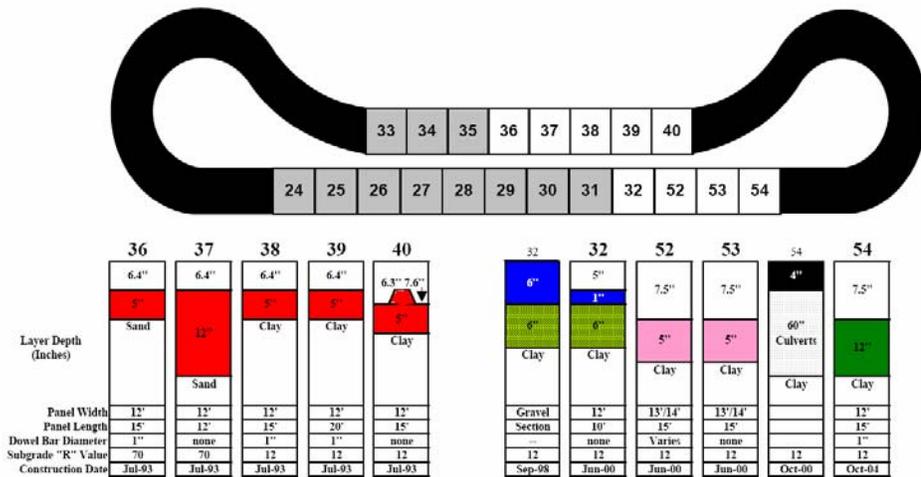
Mn ROADS Low Volume Road Concrete Test Sections
